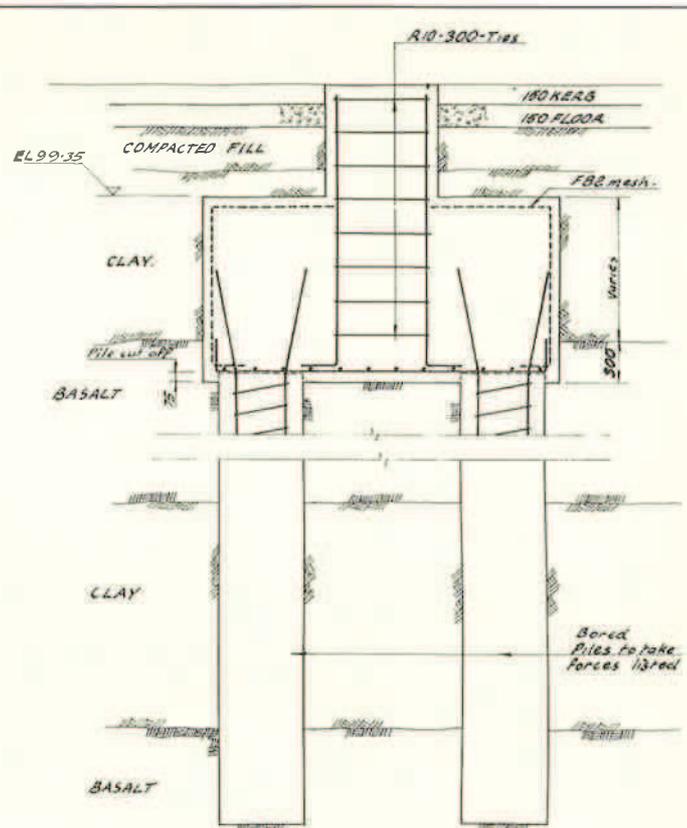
Bored piles to take forces listed — elevations and part section of double beams.
